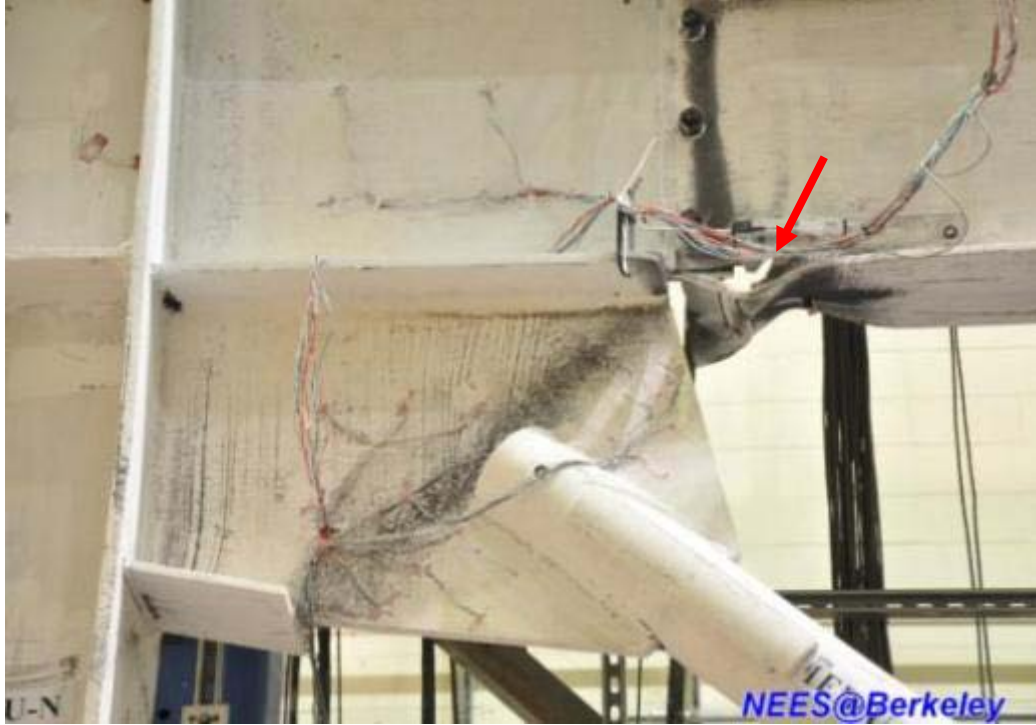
Crack propagation into the web at east side lower beam (Specimen TCBF-B-2)
